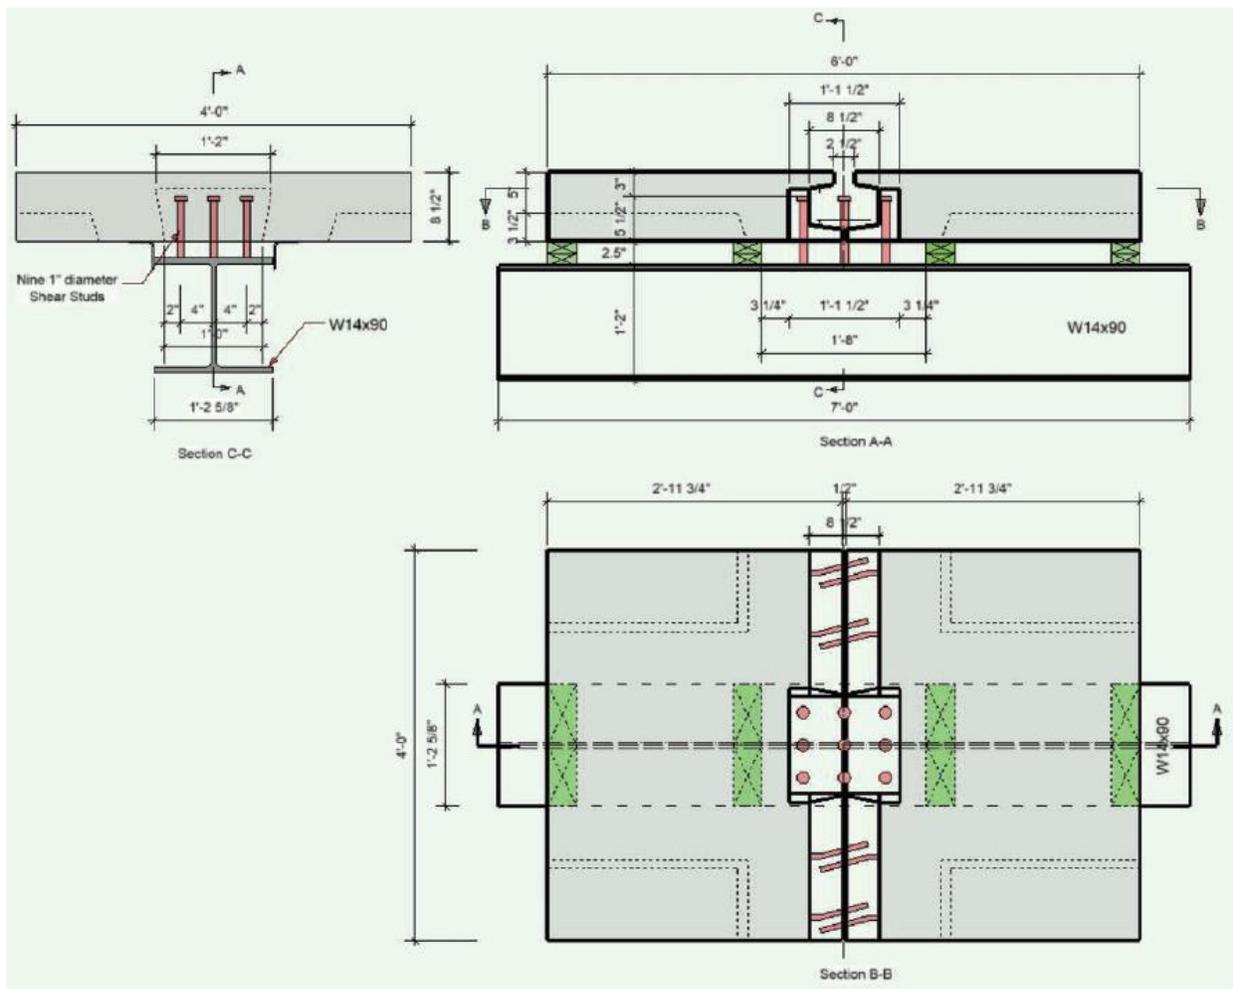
Push-off Test Specimen of UHPC Connection on Steel Girder (1in. = 2.54cm, 1ft = 0.3m).
